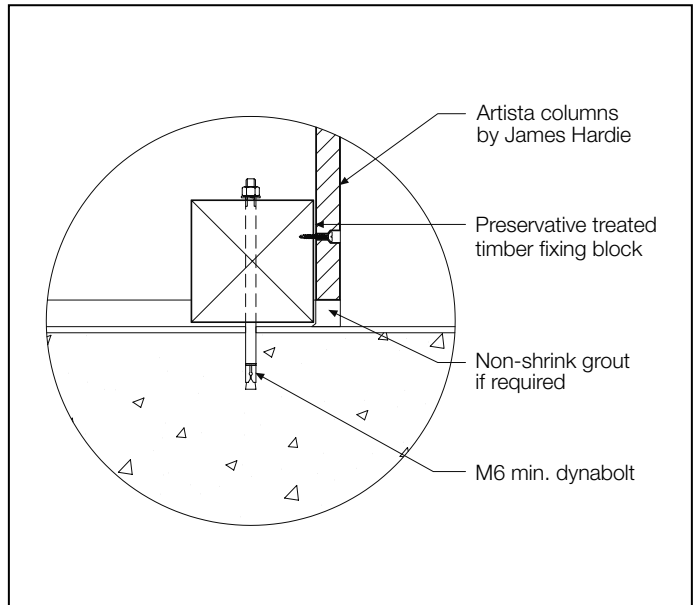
TYPICAL BASE FIXING DETAIL 2
